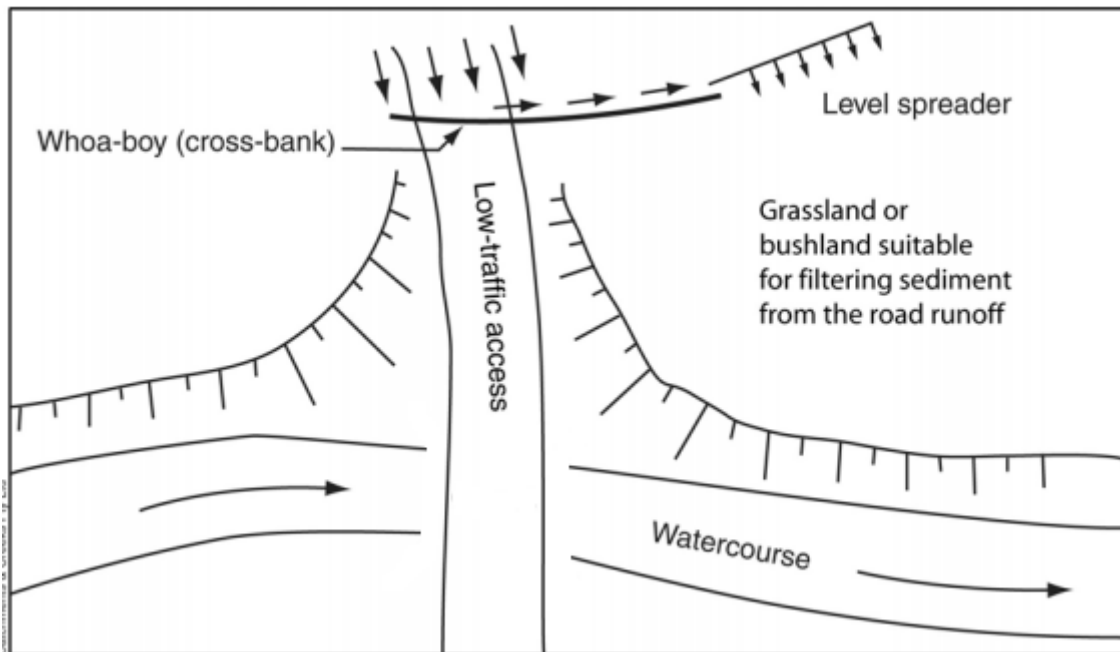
Construction technique for water crossing taken from IECA (2008)
